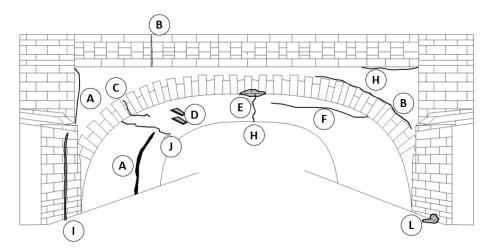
Most frequent damage types and location in arch bridges. A) cracks in the abutment joint or pier with arch; B) cracks in spandrel beam and parapet wall; C) cracks in corners; D) loosening of voussoirs; E) detachment at the arch key; F) longitudinal cracks; G) disconnection of the arch ring; H) opening of the spandrel beam; I) opening at the abutment wall; J) crosswise cracking; K) cracking at the arch key; L) deposits.
